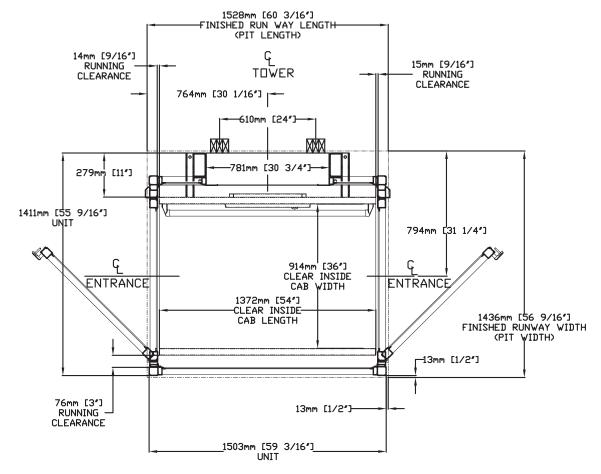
Plan View - Type 2, 36" x 60" Cab, Hoistway Application
